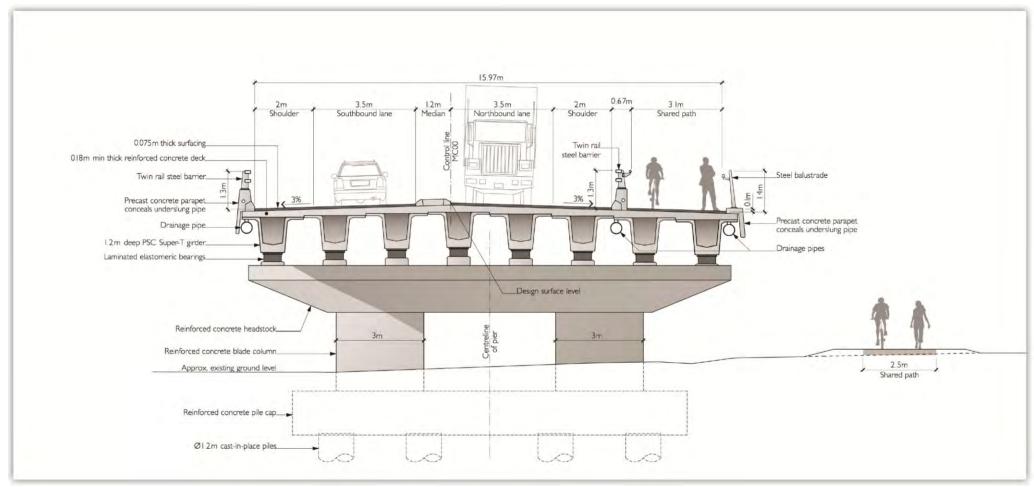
Bridge cross-section 1 (southern end of the bridge)
